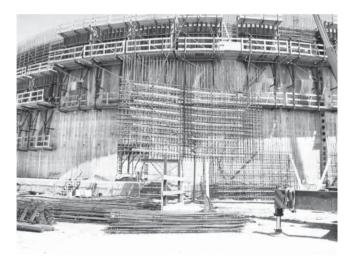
A pre-assembled reinforcement cage being installed.
